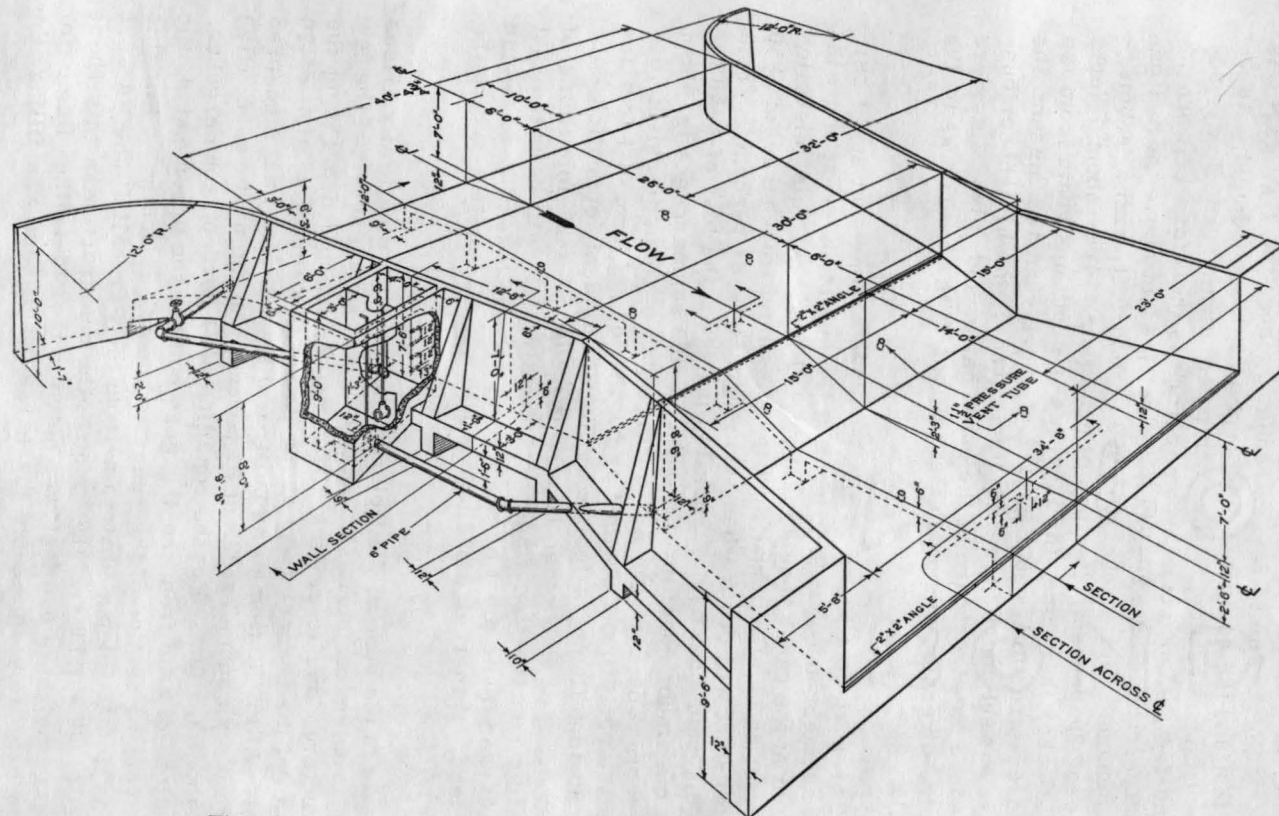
Large Parshall Measuring Flume of reinforced concrete, with 30-foot throat.
